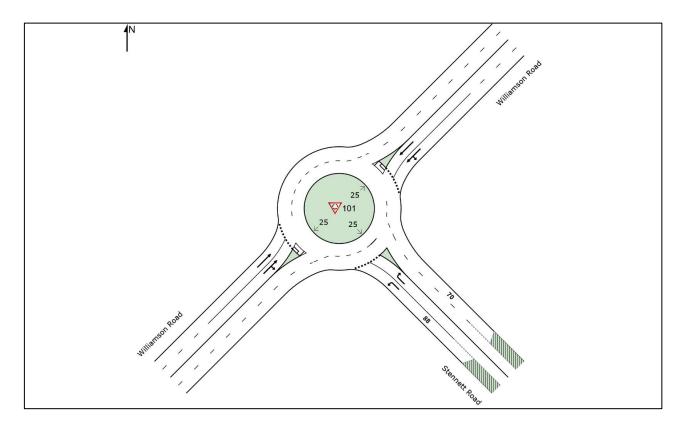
Williamson Road x Stennett Road Existing Intersection Layout
